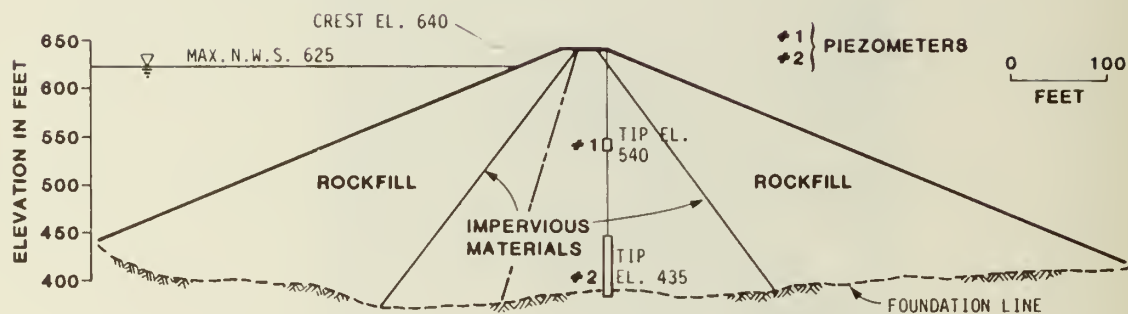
CROSS-SECTION OF ANDERSON DAM, SHOWING PIEZOMETER LOCATIONS.
